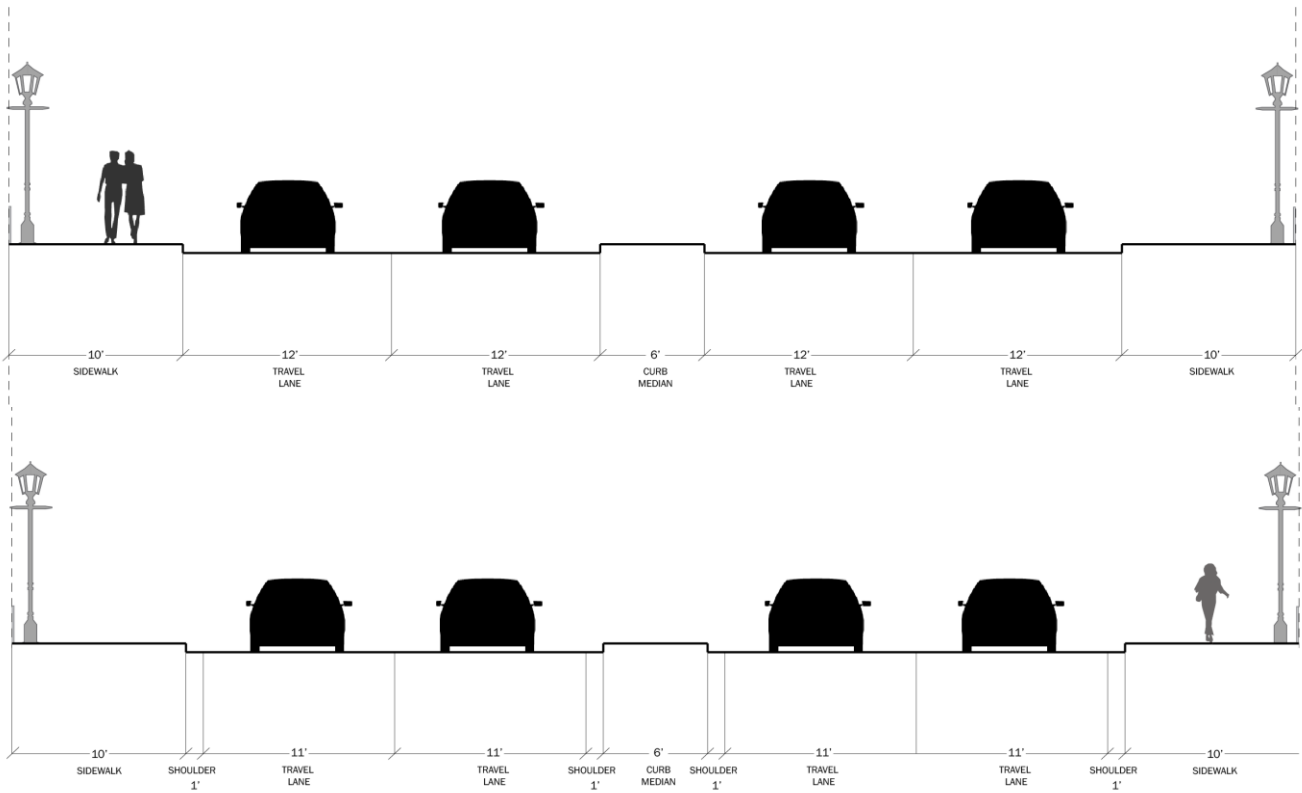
Existing (top) and Proposed (bottom) cross section, State Street (7th Street to 13th Street)
